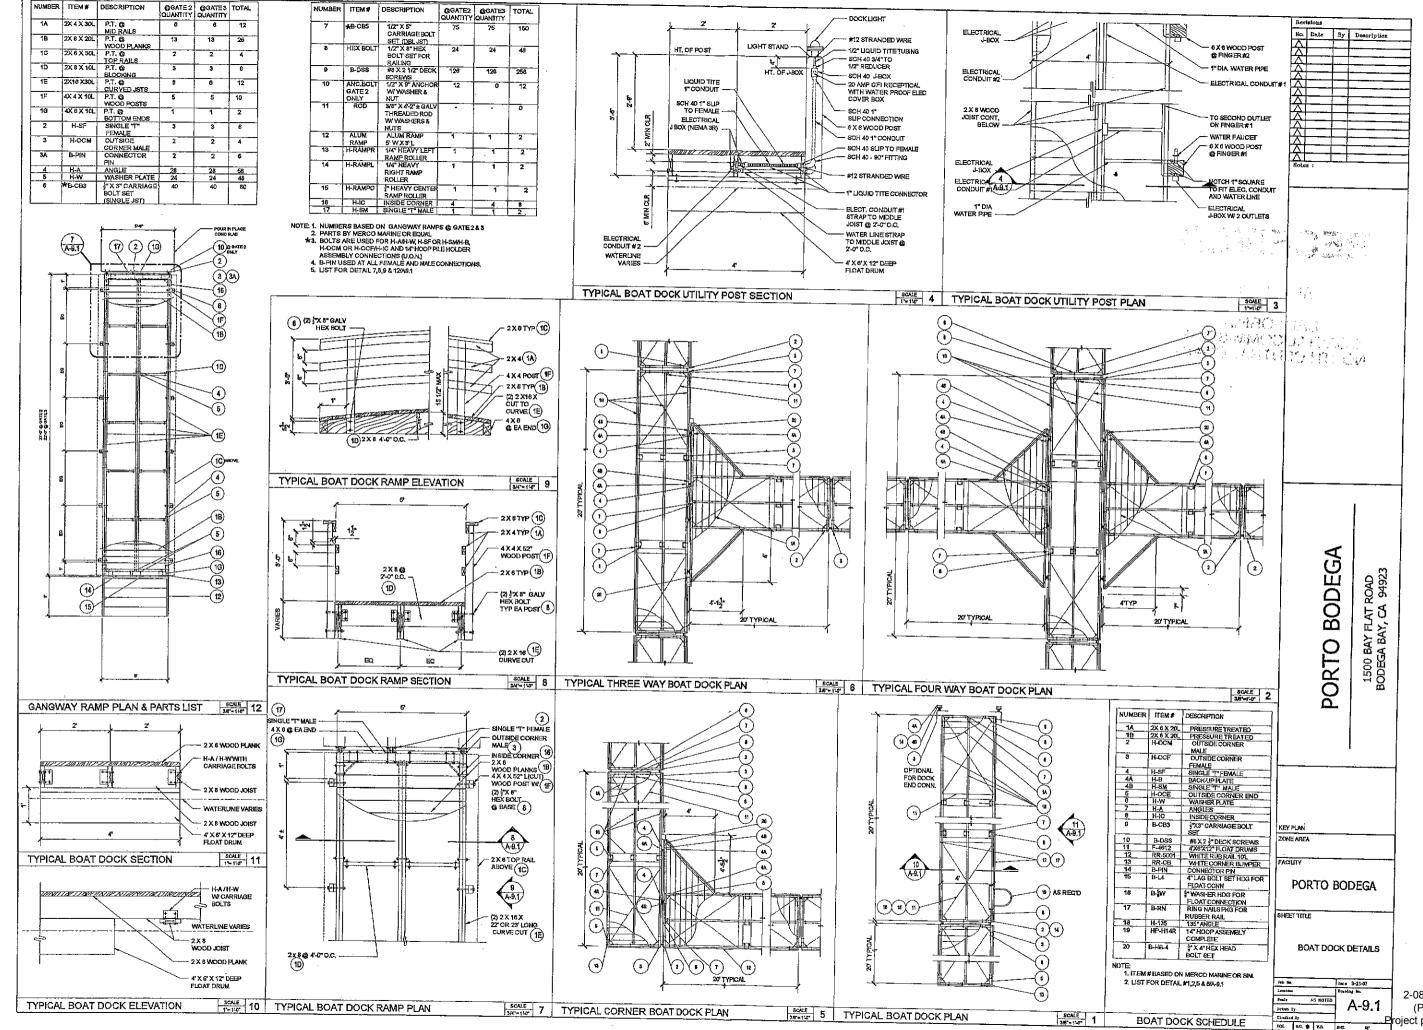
2-08-013 & 2-10-030 (Porto Bodega LP) roject plans and photos
